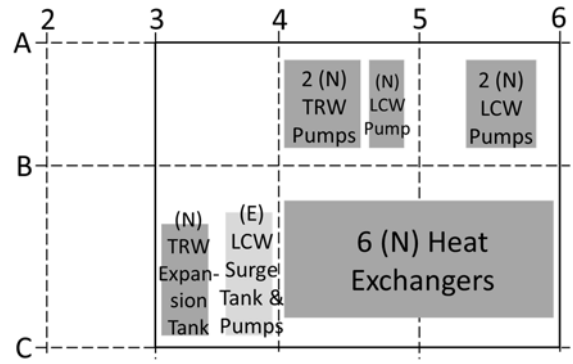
Equipment Layout on 2nd Floor: New (N) Work (Bascoul et al. 2017)
